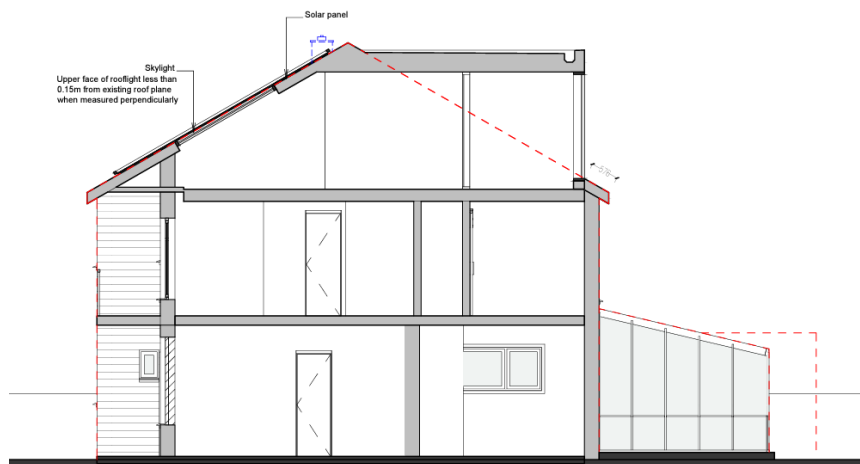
Proposed Section through 94 Temple Sheen Road looking east
